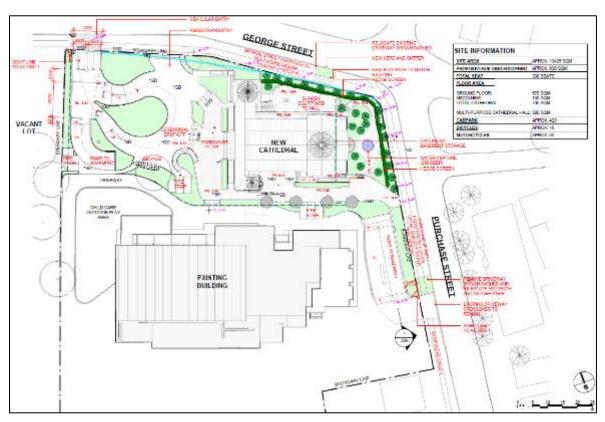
Site Plan showing proposed building (Source: Design Delta Architects)
